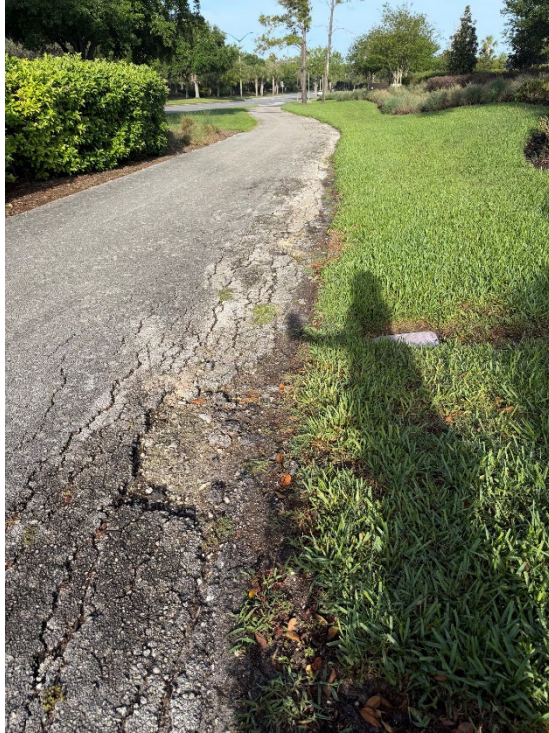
Asphalt Raveling and Base Failure (No Observed Changes)
